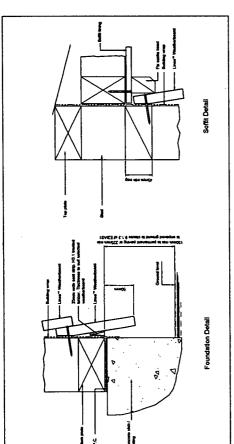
DIRECT FIX CONCRETE SLAB AND SOFFIT
